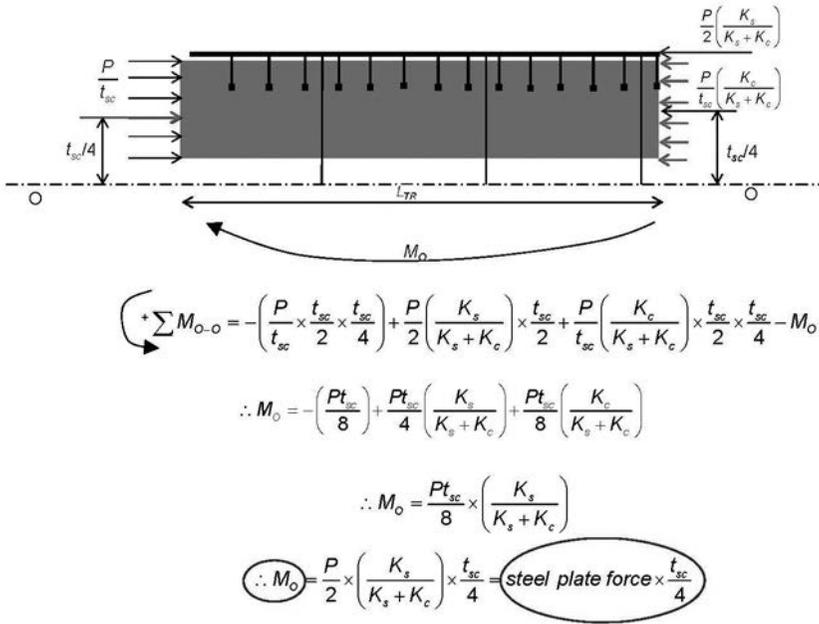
Eccentric moment, M_o , acting on the split section.
